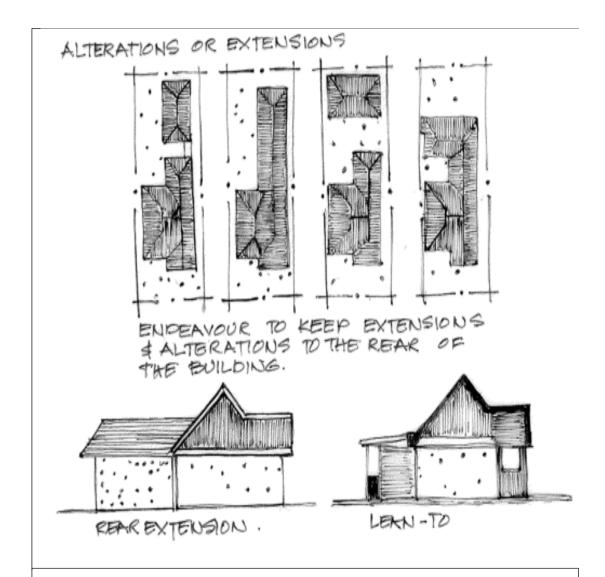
Appropriate Roof and Plan Forms for Alterations and Additions to ... Buildings
